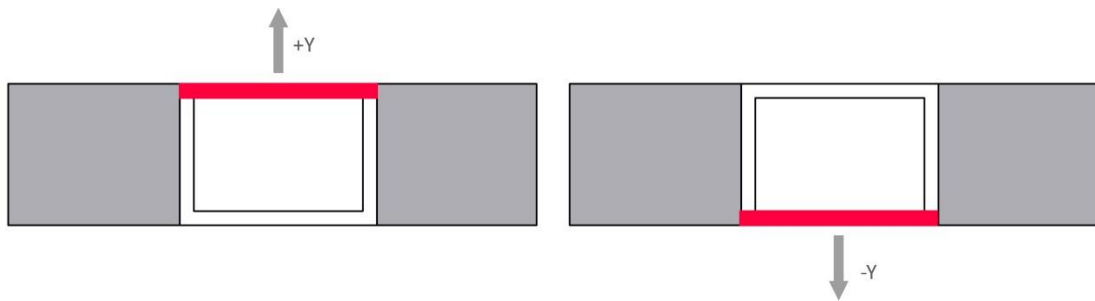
In the case above, only the direction +Y and -Y should be evaluated because walls perpendicular to loading direction +X and -X are not likely to fail out-of-plane because of the presence of an adjacent building (plan view)
